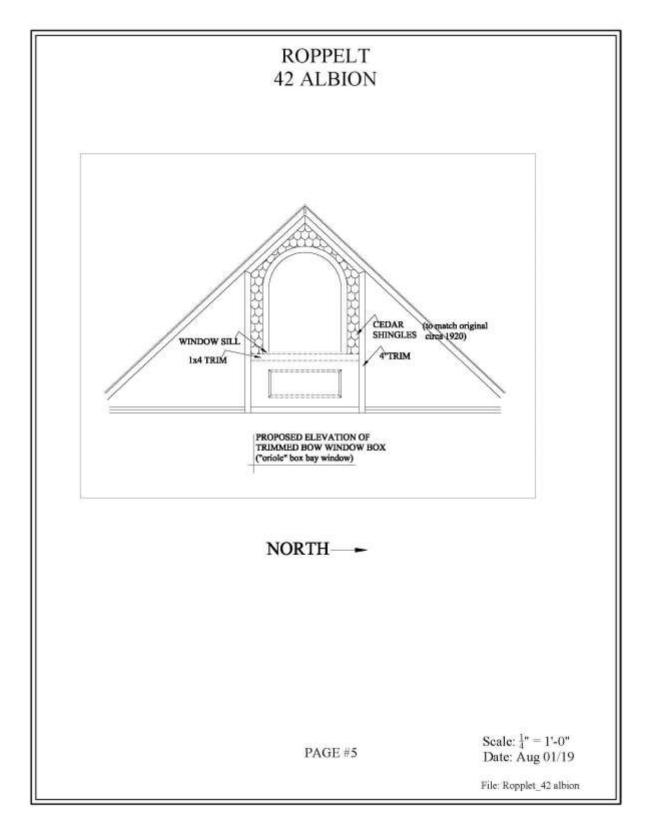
Detail showing exterior finishes of proposed oriel window of the house at 42 Albion Street. Note the existing window is a sash window with separate arched transom (see Image 3, Appendix B).
